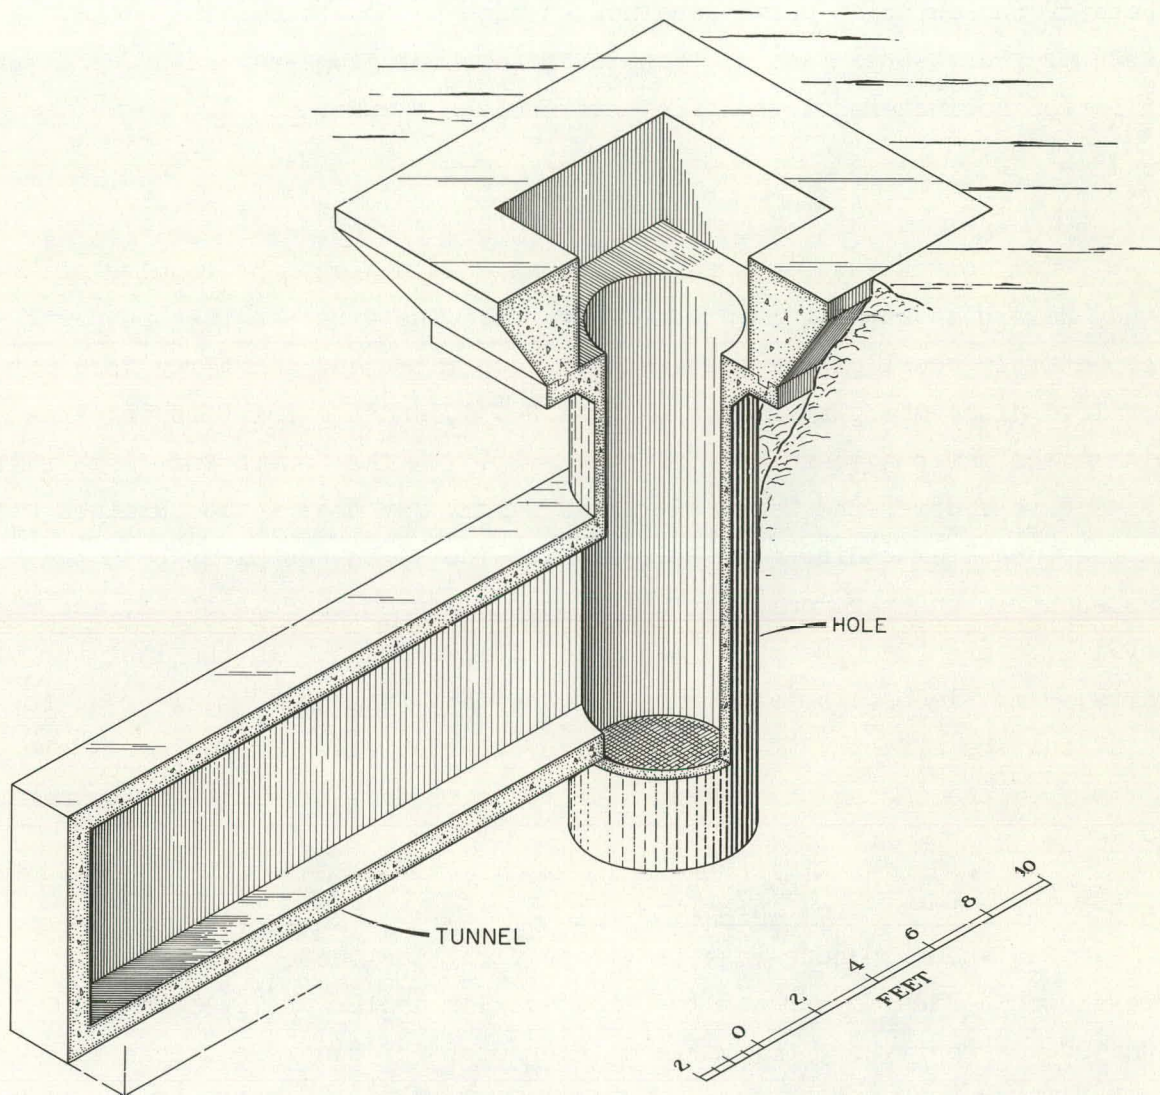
Cutaway View of Hole No. 1 and Tunnel.
